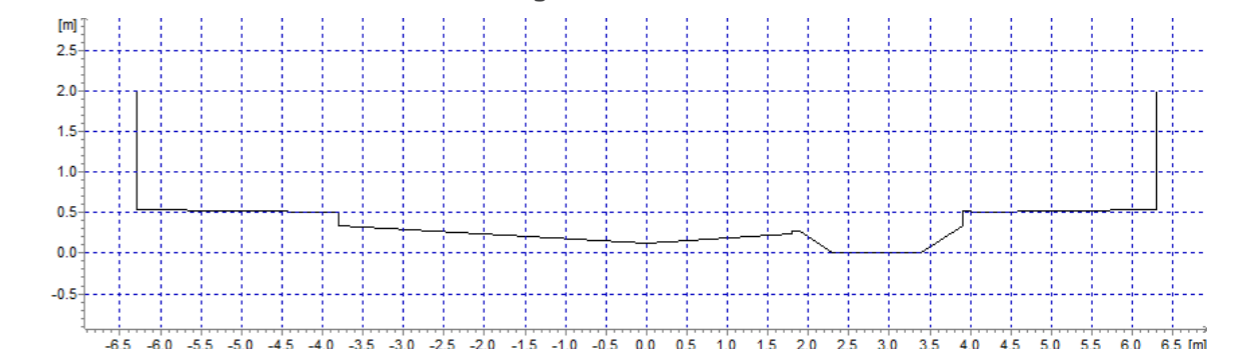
Cloudburst road with longitudinal drainage elements in the north side of the road as well as a V profile, where the First Flush can be collected and be diverted to the existing wastewater pipe at 1 L/s/h.
